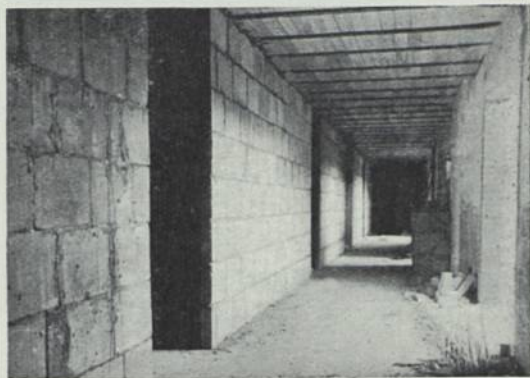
Banana ripening house, Copenhagen. Cell concrete partitions and floor insulation
